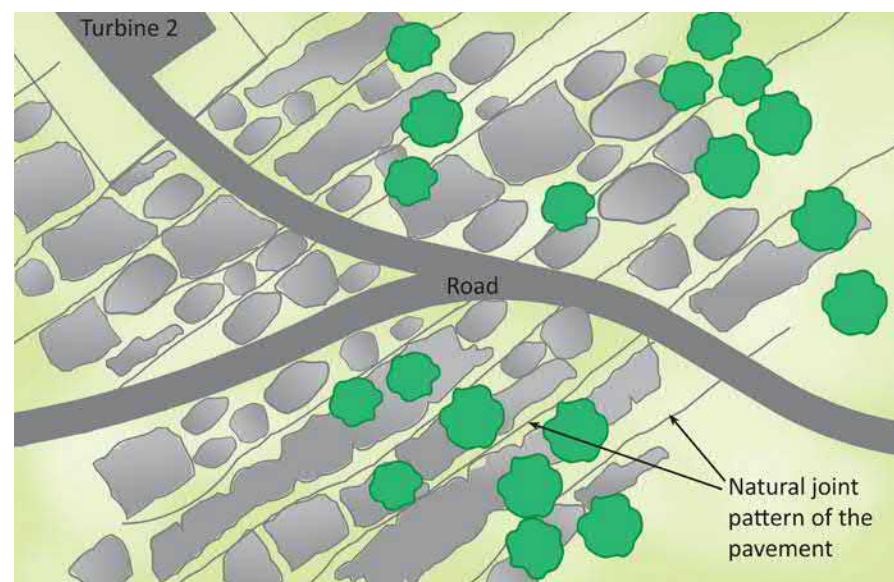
Turbine 2. Limestone pavement solutions, plan view.
